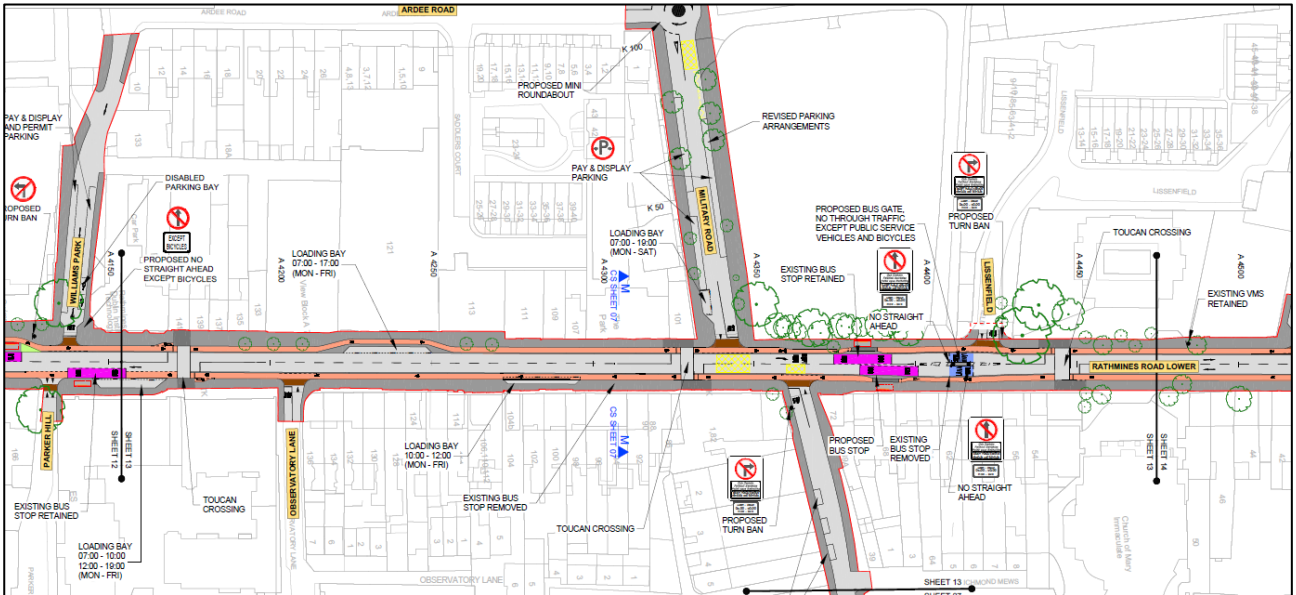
Extract from General Arrangement Drawings (Sheet 13)
